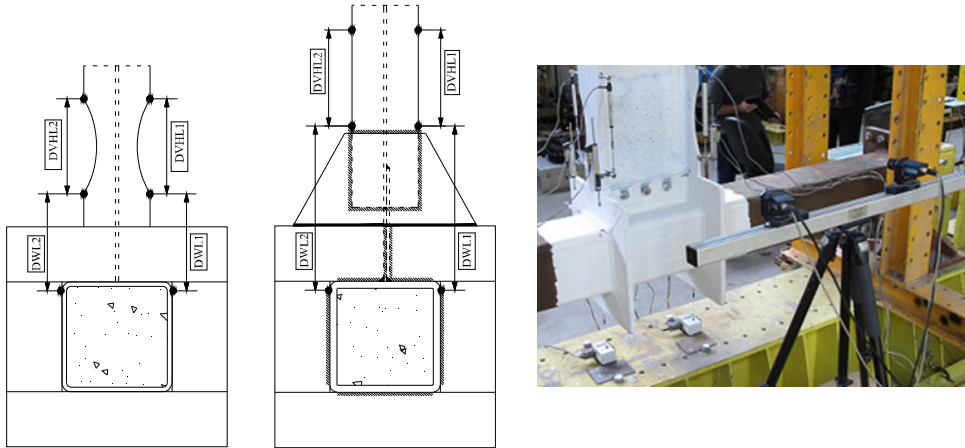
Instrumentation of beam, welded connection, external diaphragm, and connection zone prepared by whitewashing
